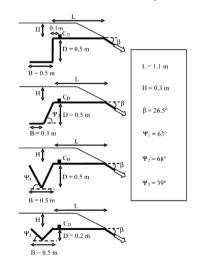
Anchor trenches for a fixed space at the top of the slope equal to 1.6 m.
